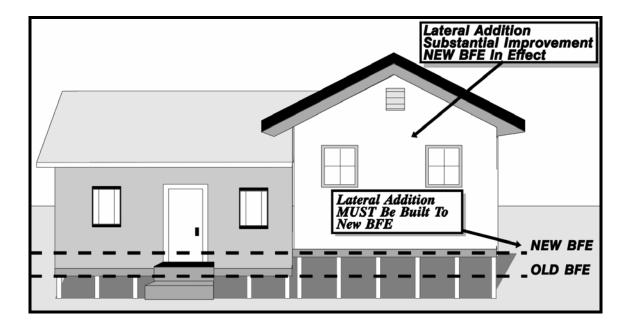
Substantial improvements to post-FIRM buildings must be elevated above the new base flood elevation. Nonresidential buildings may be floodproofed.
